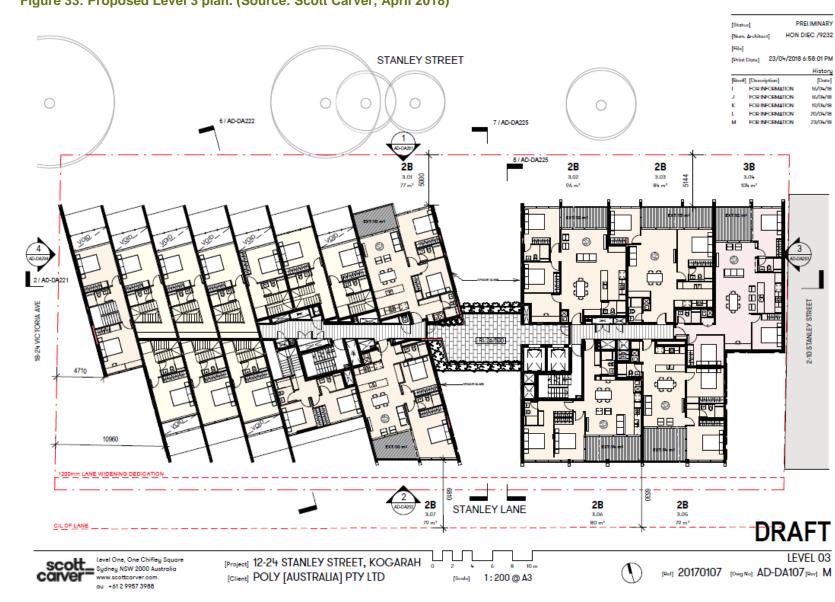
Proposed Level 3 plan. (Source: Scott Carver, April 2018)
